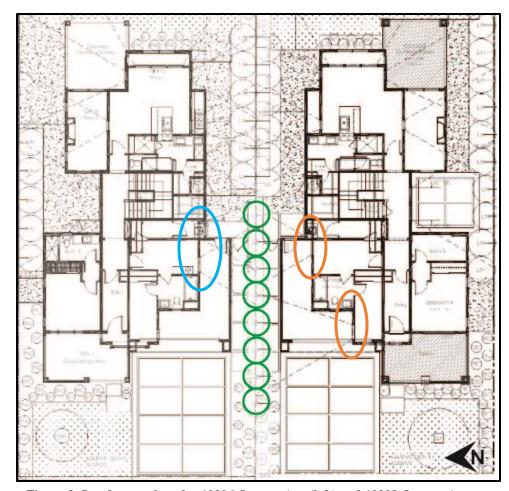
Landscape plans for 10206 Orange Ave (left) and 10208 Orange Ave (right) demonstrating shared privacy plantings
